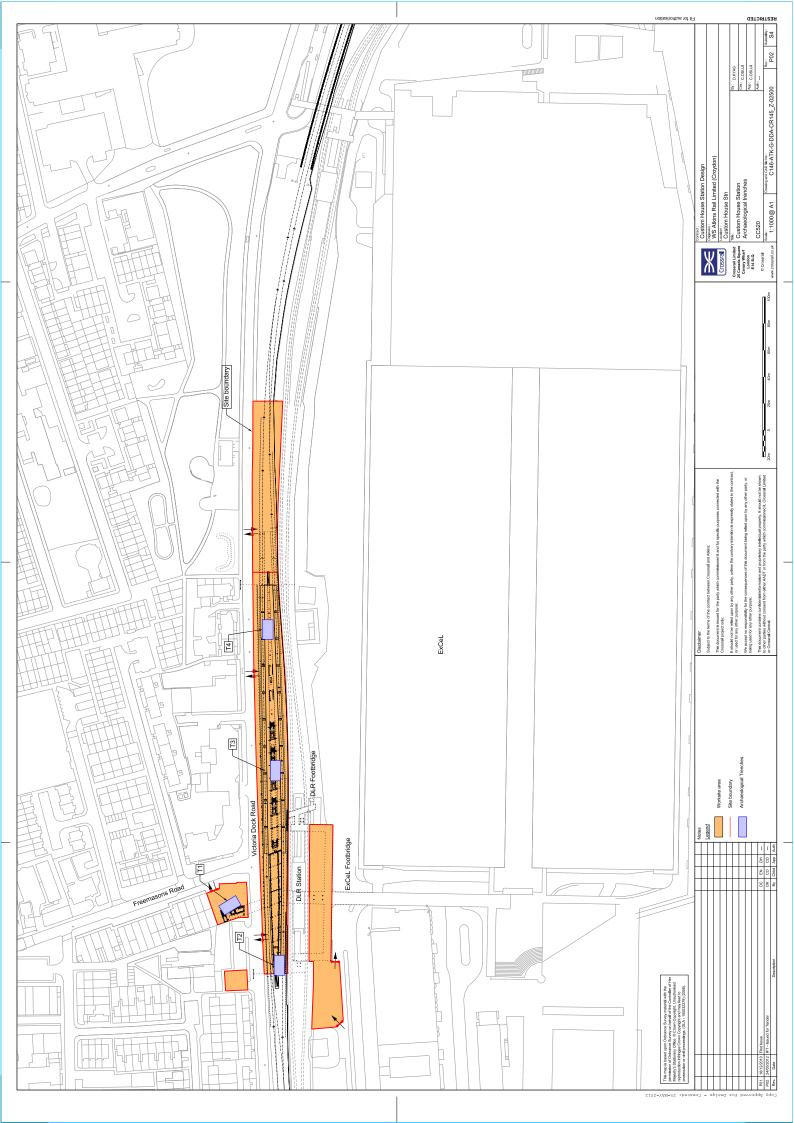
Drawing Site plan C146-ATK-G-DDA-CR145_Z-02500
